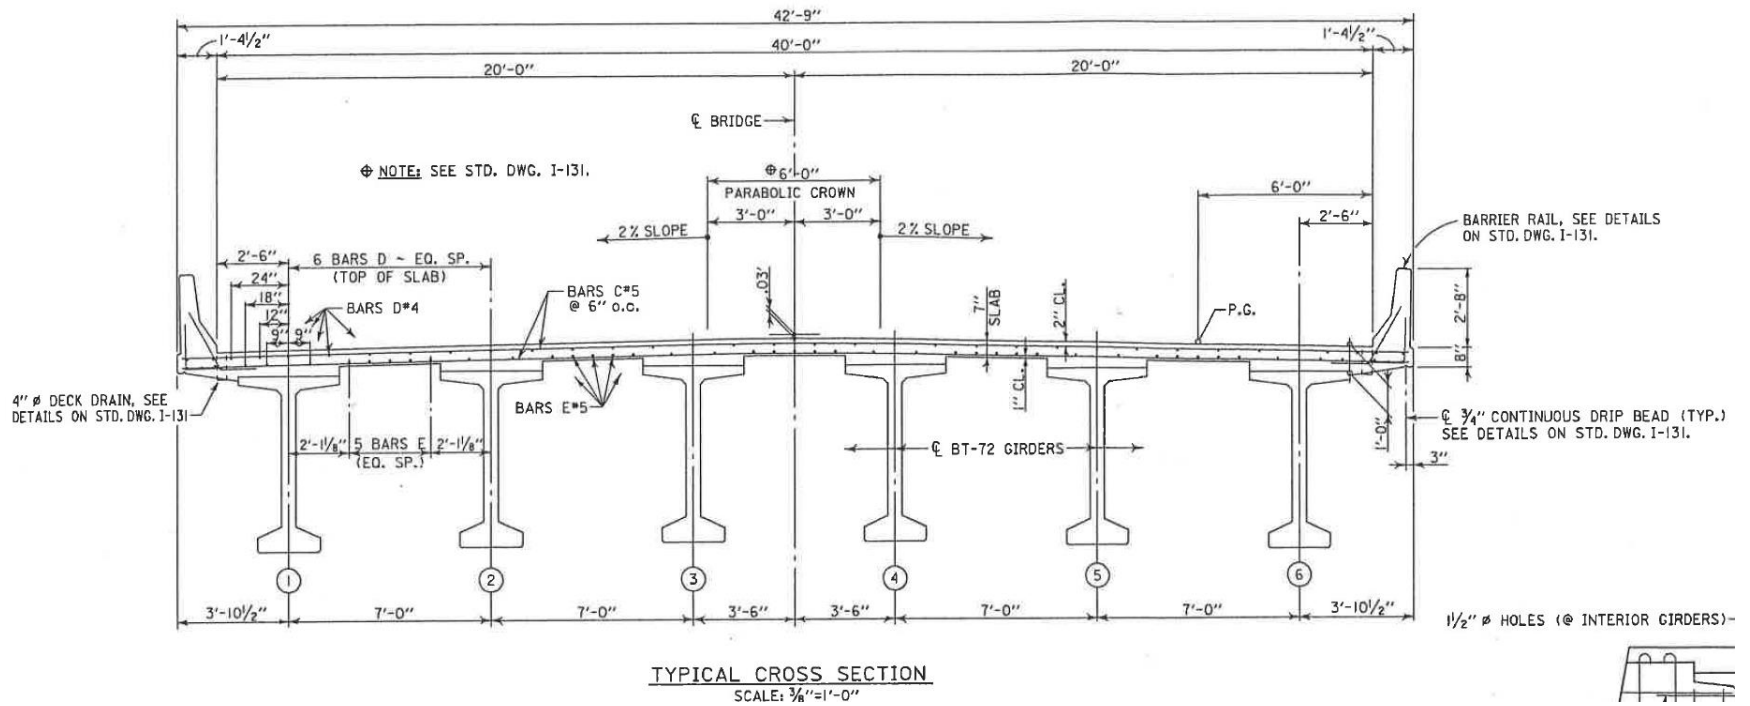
Marshall County typical bridge deck cross section (ALDOT 2003)
